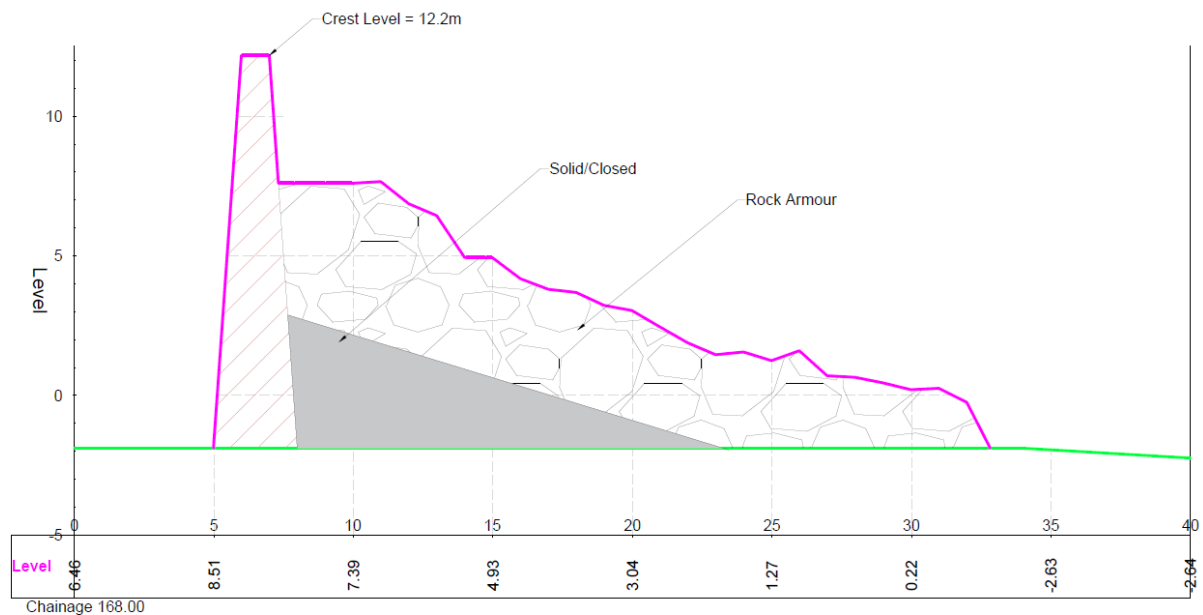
Section profile for the North-Westerly failing Rock-Armour section of the existing breakwater
